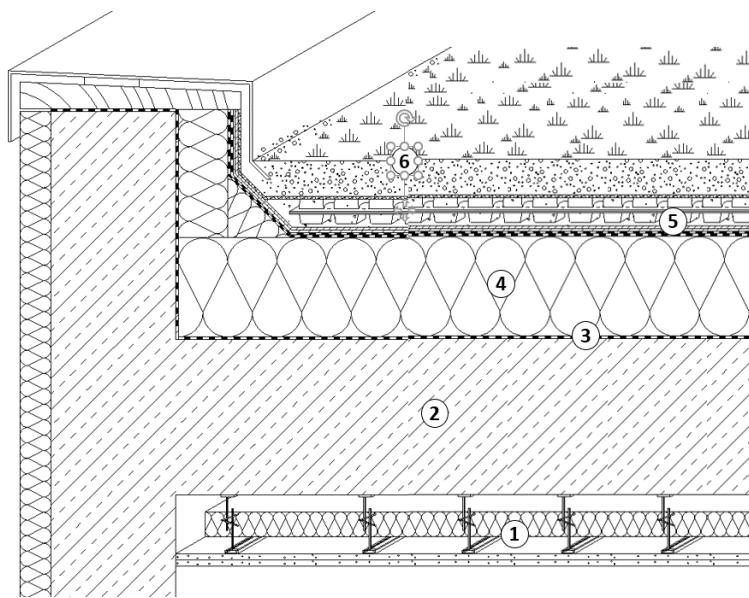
Layered structure of the roof variant 3 – 5 of the MFH/Office
